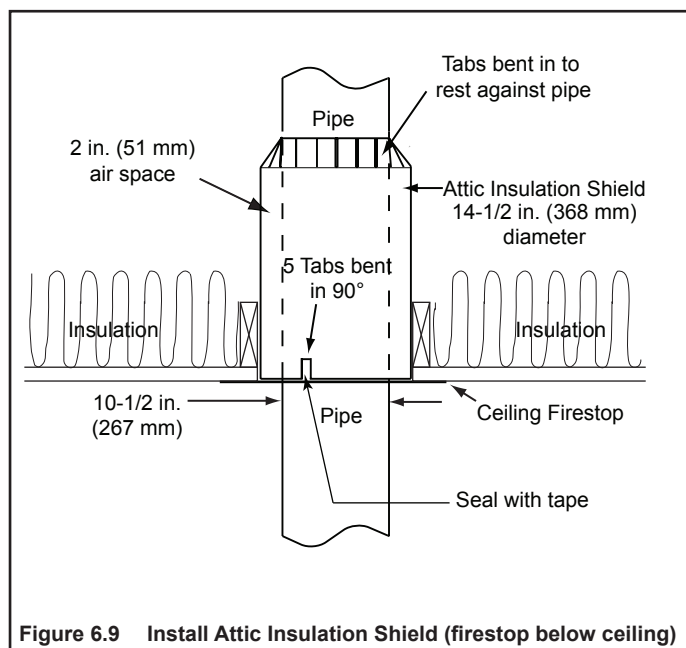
Install Attic Insulation Shield (firestop below ceiling)
